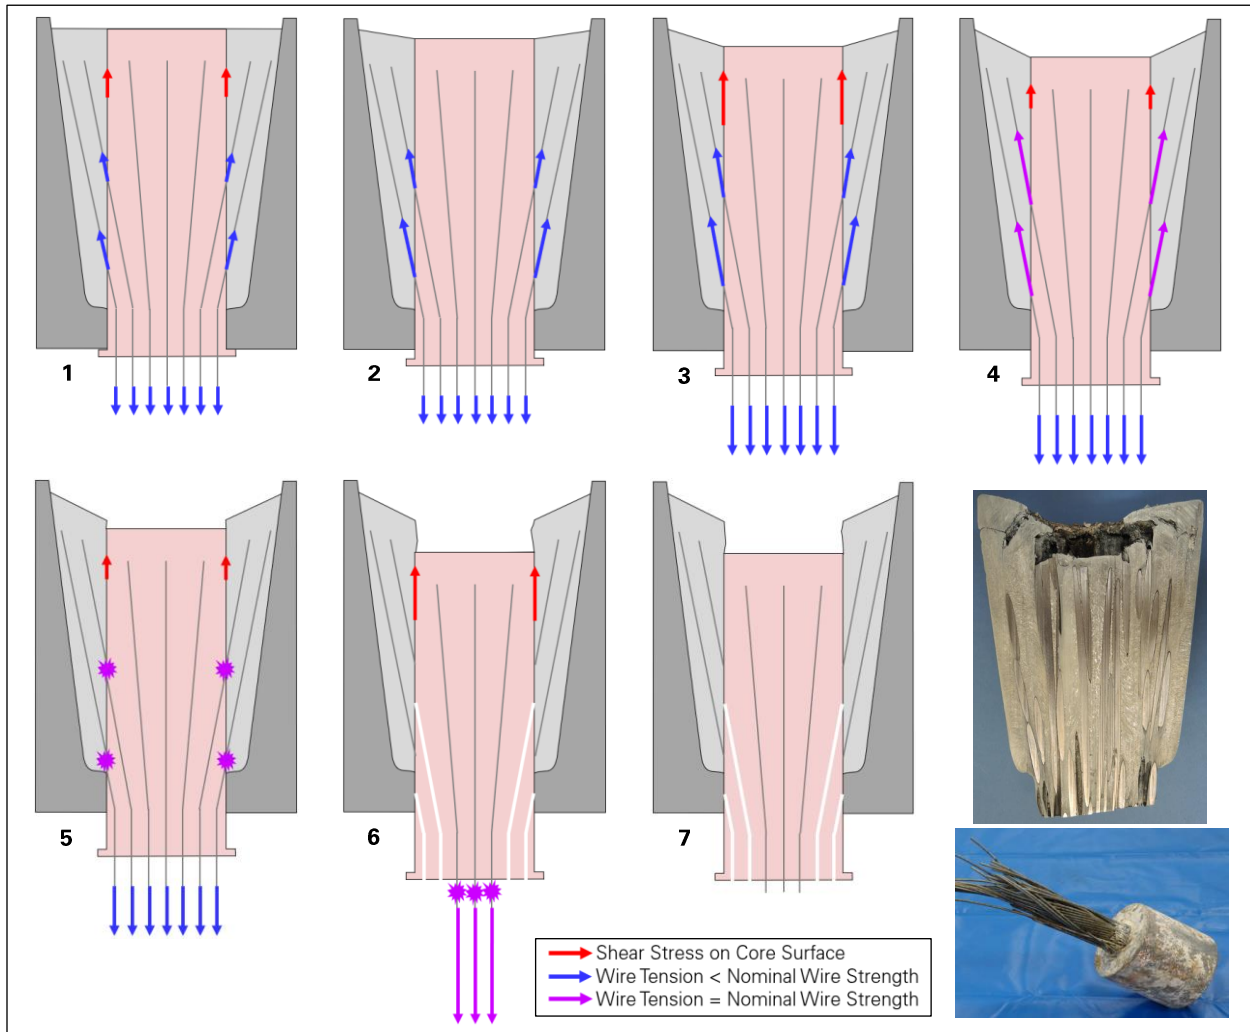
Behavior and failure of socket M4-4_T (photos: Socotec).
